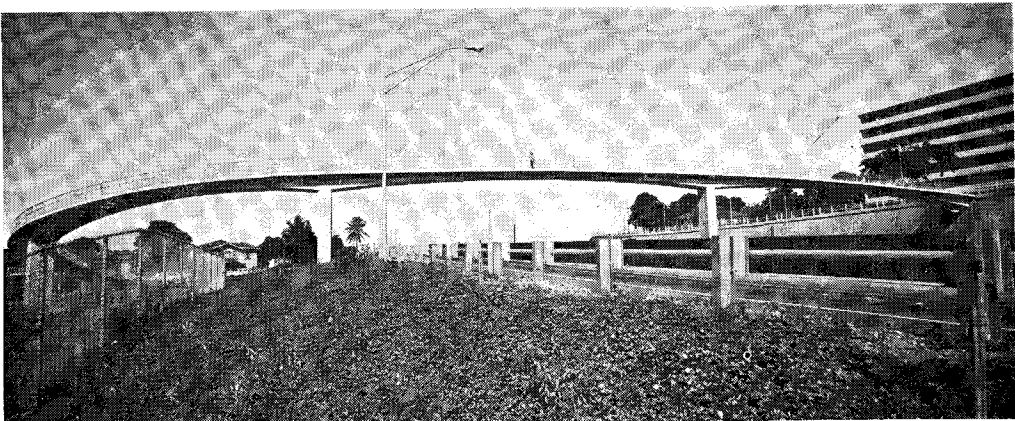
Alapai Street Pedestrian Overcrossing—one of Hawaii's attractive, prestressed concrete bridges.
